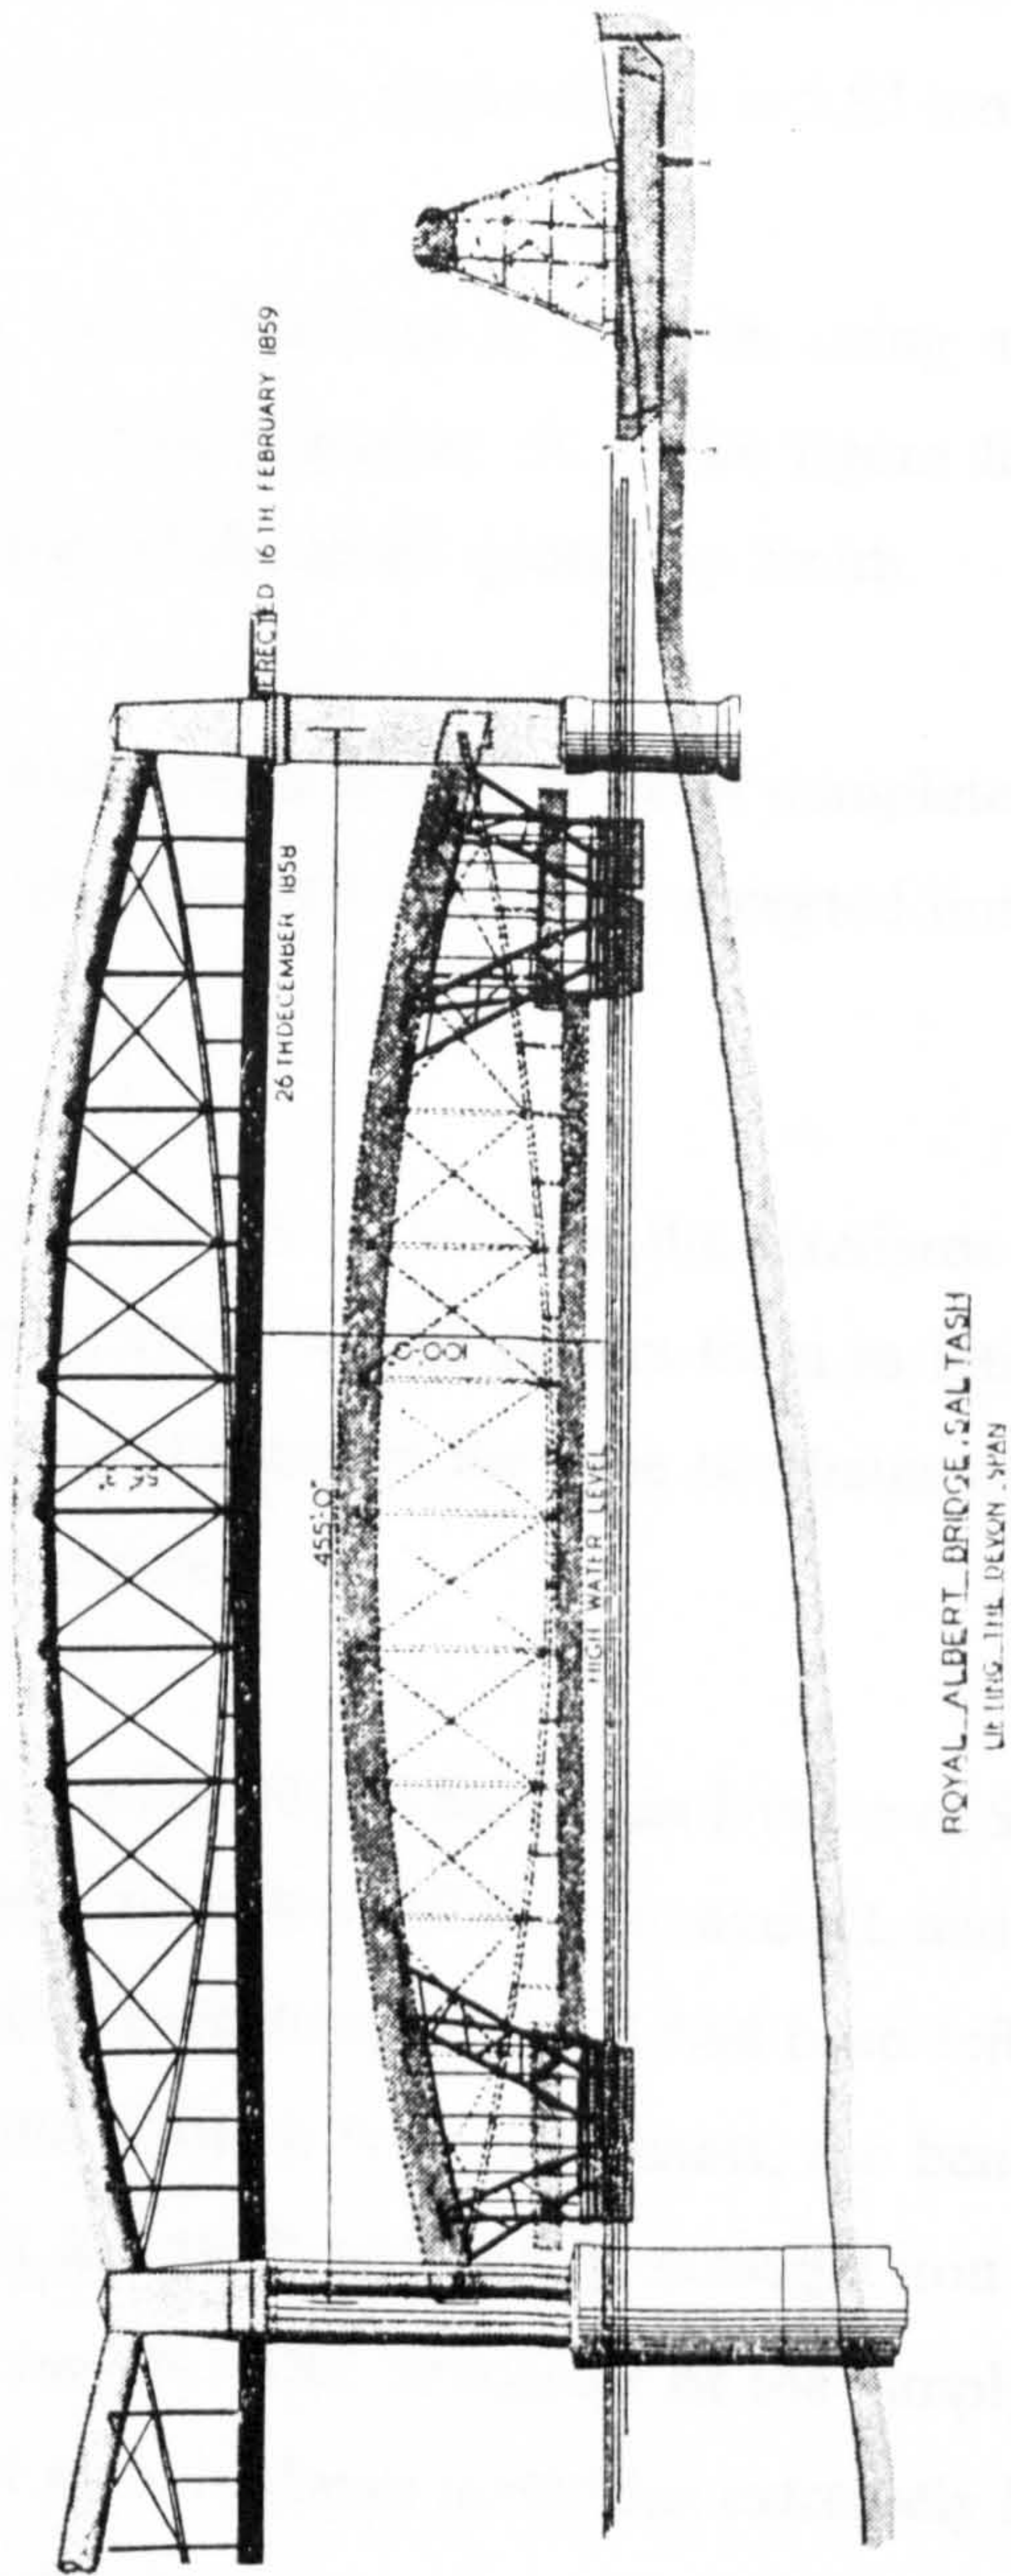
A Saltash Bridge erection method. The prefabricated spans were floated out and jacked up into their final position. (Berridge, 1969)
